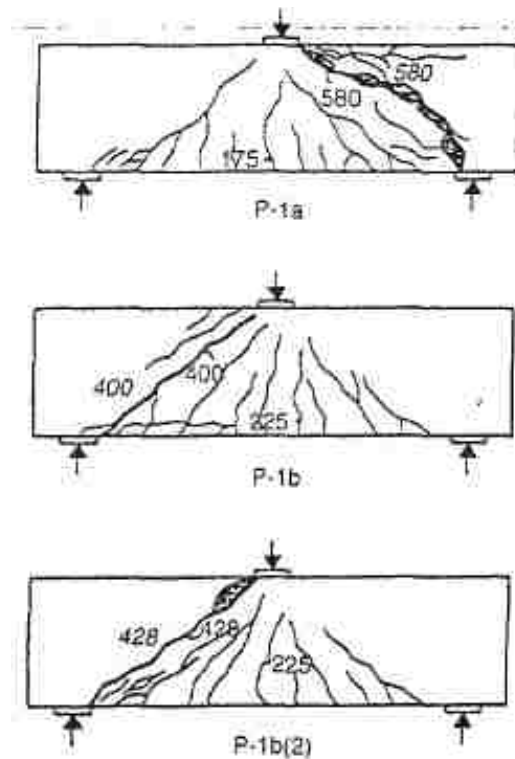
Teng et al. (1998b) Crack Patterns at Failure
